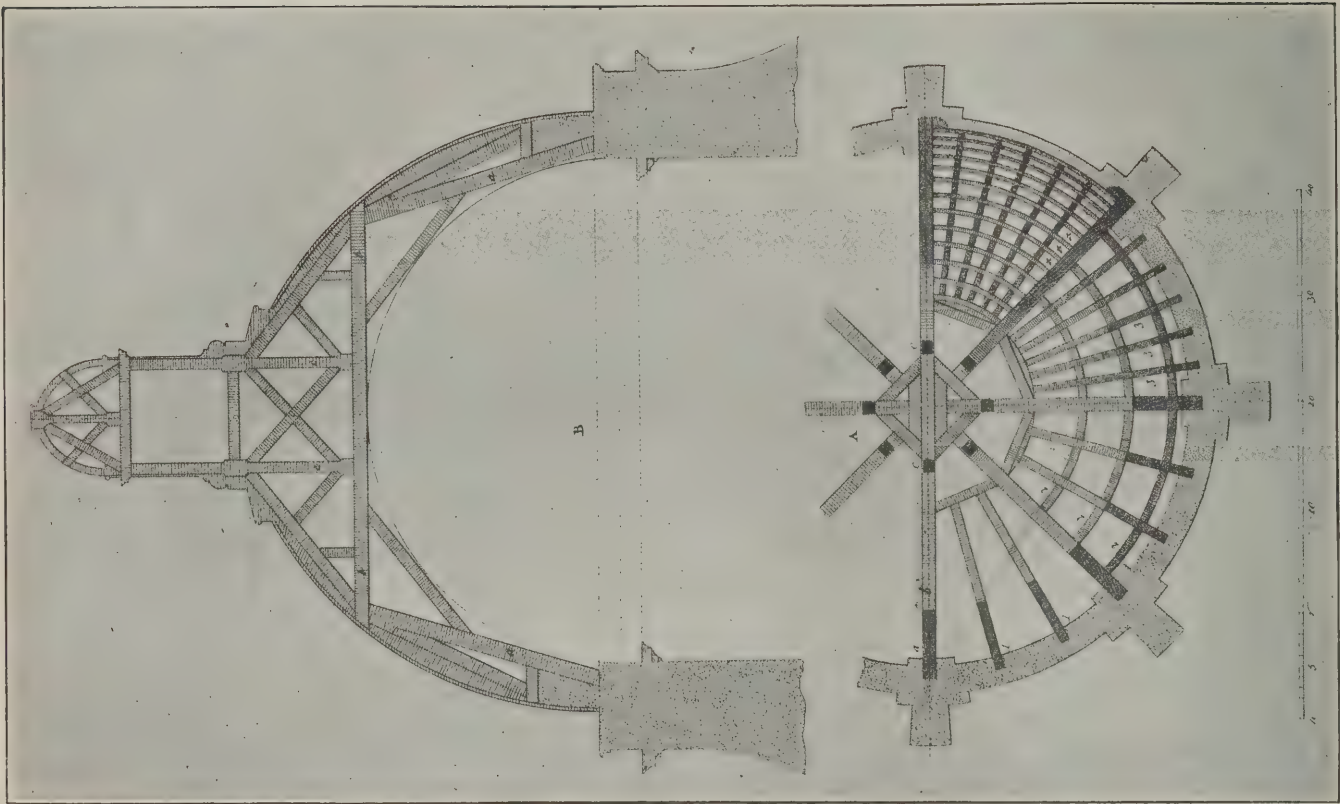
Plan and Section showing Wooden Framing of Dome and Lantern.
